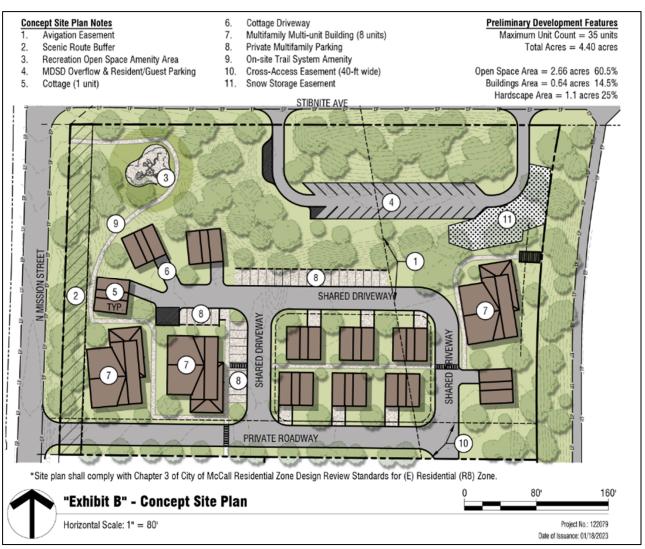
Development Agreement Concept Site Plan - Refer to ZON-22-02 for full document
